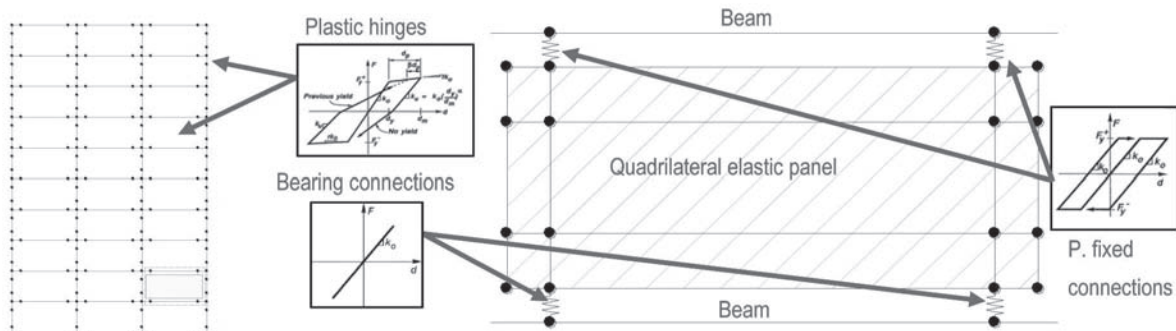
Modelling of the frame (10 storey case) and cladding panel with hysteretic rules used
